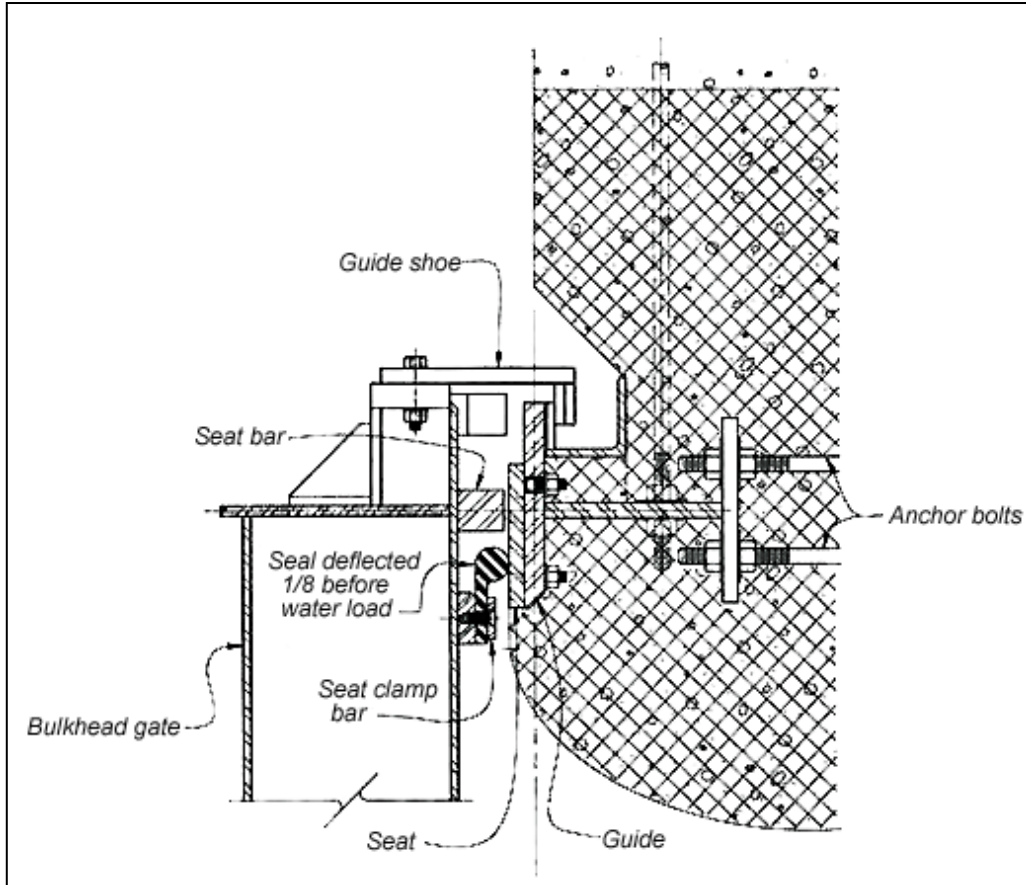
Section through bulkhead gate (or stoplogs), and seats and guides embedded in the face of the structure.
